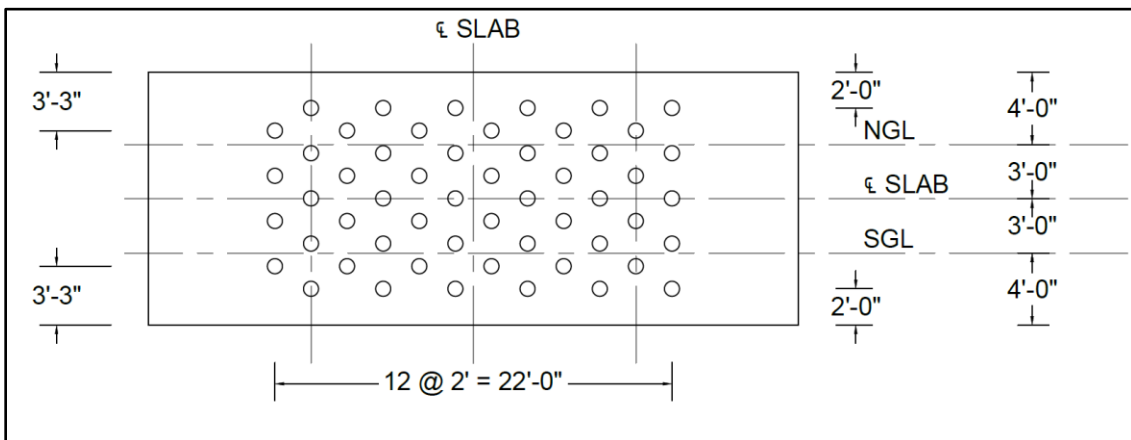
Plan view showing the layout of heating lamps on the prototype bridge deck
